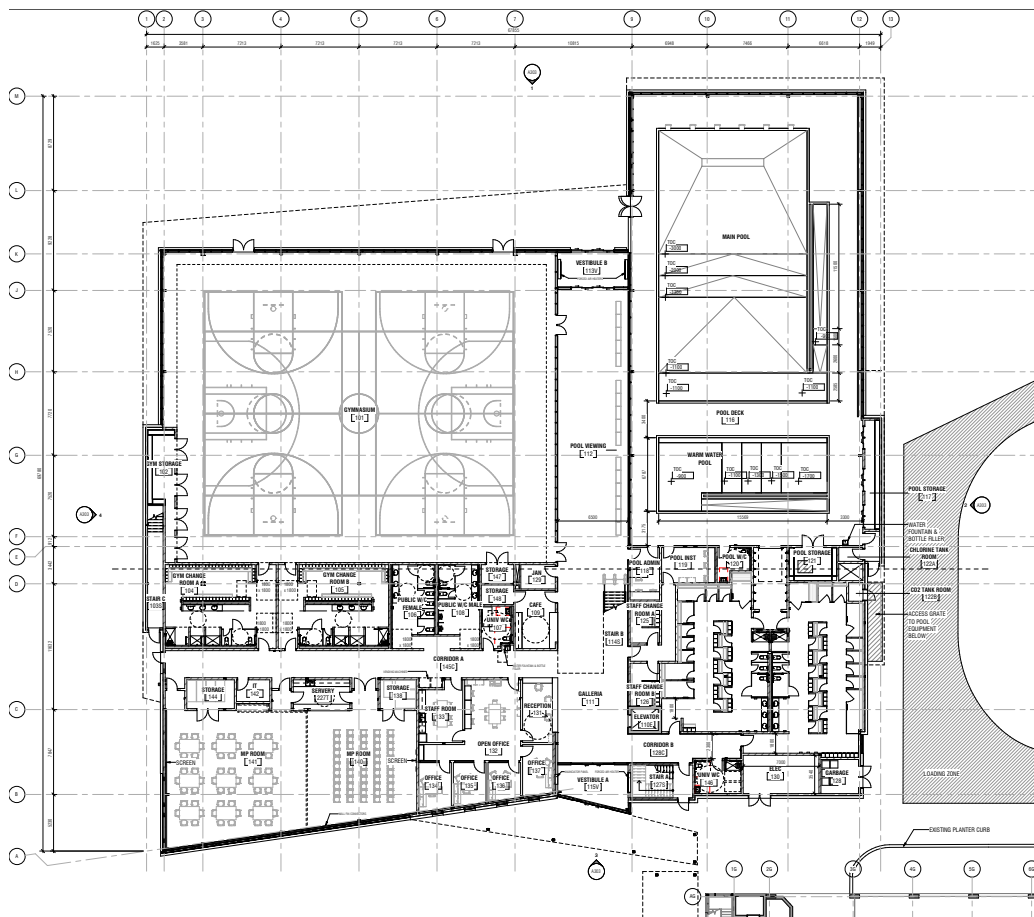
Ground Floor Plan, 2018 (Diamond Schmitt Architects)
